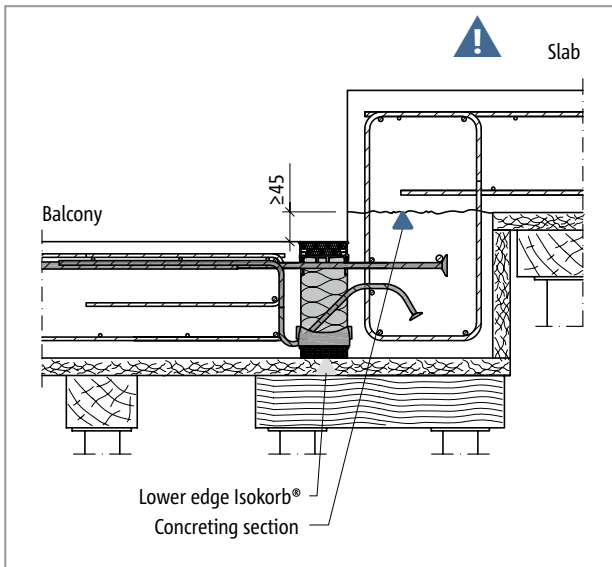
Schöck Isokorb® T type K-U: Cast-in-place concrete balcony with height offset downwards
